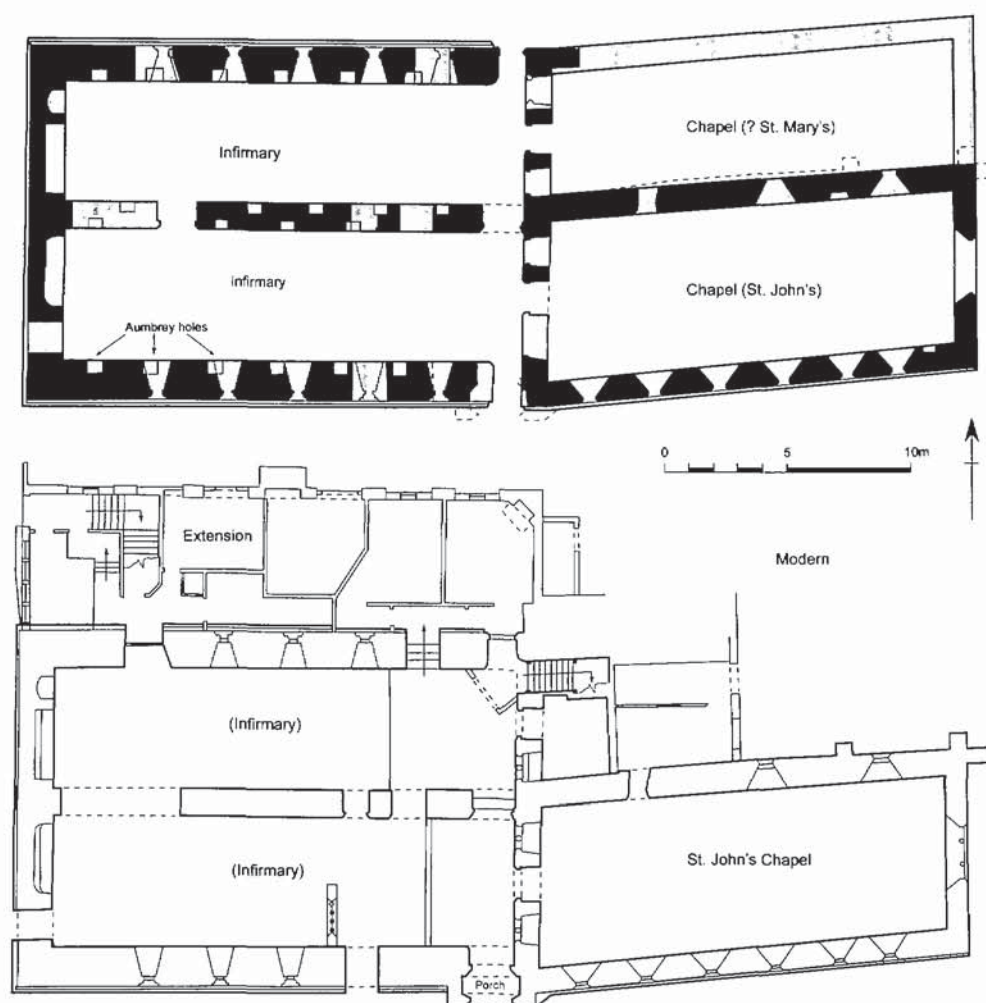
St John's Hospital – (a) 15th century reconstruction (b) modern plan
